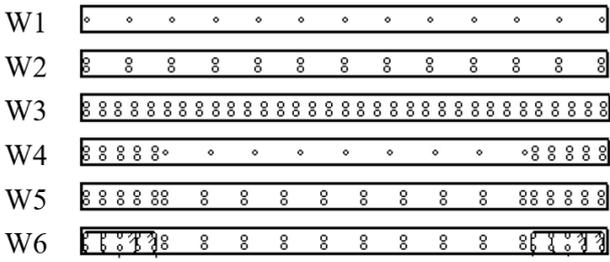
Longitudinal reinforcement layouts of W1 to W6
